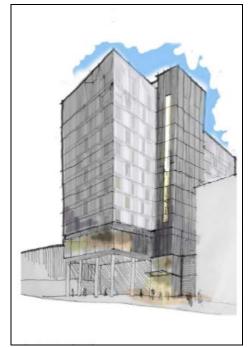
Proposed Bristol Street elevation and a sketch image of the site
